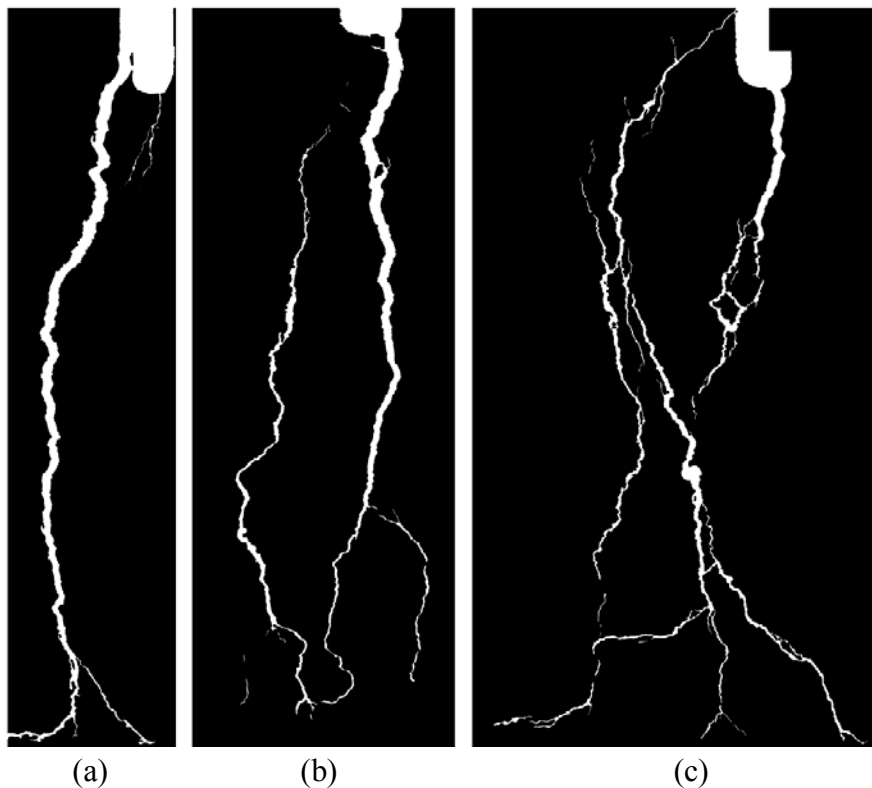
Internal crack profiles of beams subjected to bending for (a) reinforced concrete, (b) hybrid reinforced concrete with steel fibres only and (c) hybrid reinforced concrete with multi-scale fibre reinforcement (steel macro-fibres + PVA micro-fibres).
